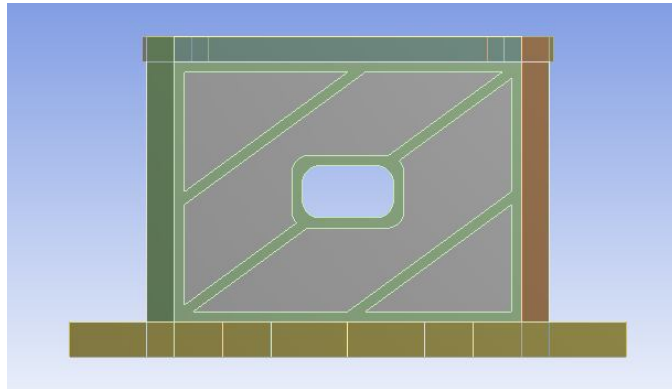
SPSW with Opening and Stiffeners Configuration EOD2
